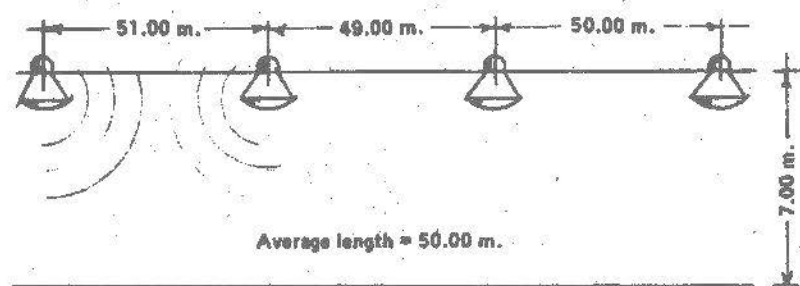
STREET LIGHT AVERAGE SPACING DISTANCE
